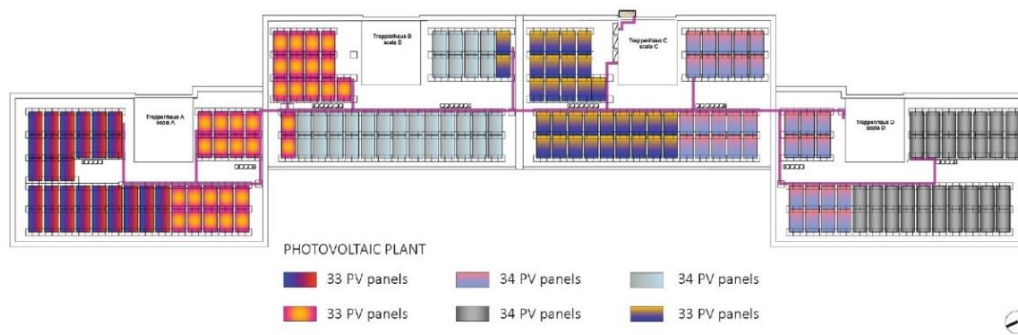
Technical plan of PV system on the roof of the north building (source: © EQ Ingegneria).
